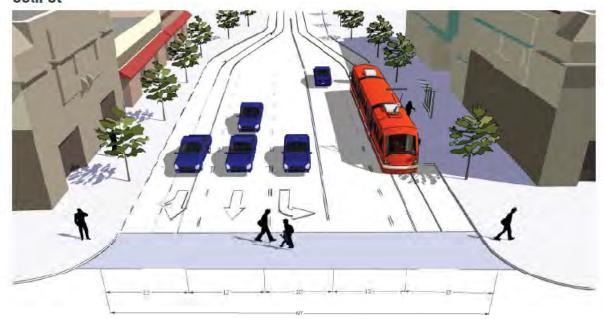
Typical Cross-Sections (Recommended Alternative)
